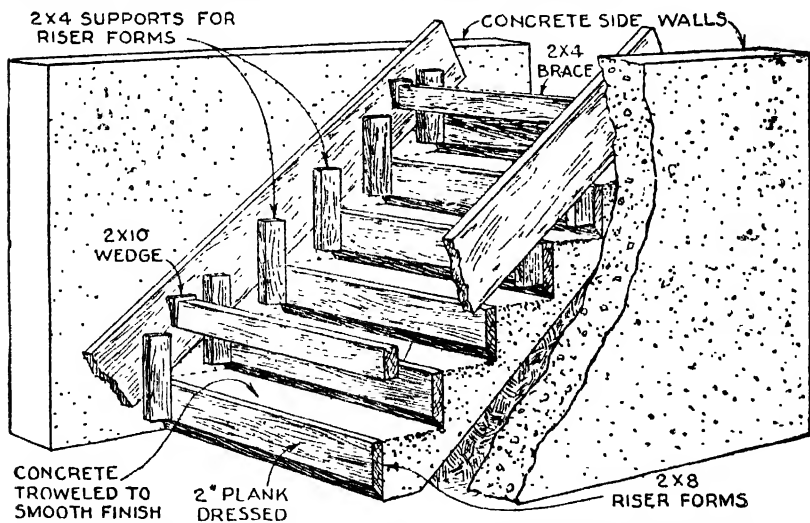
,771.—Forms for steps with concrete side walls, step slab resting on the ground.
